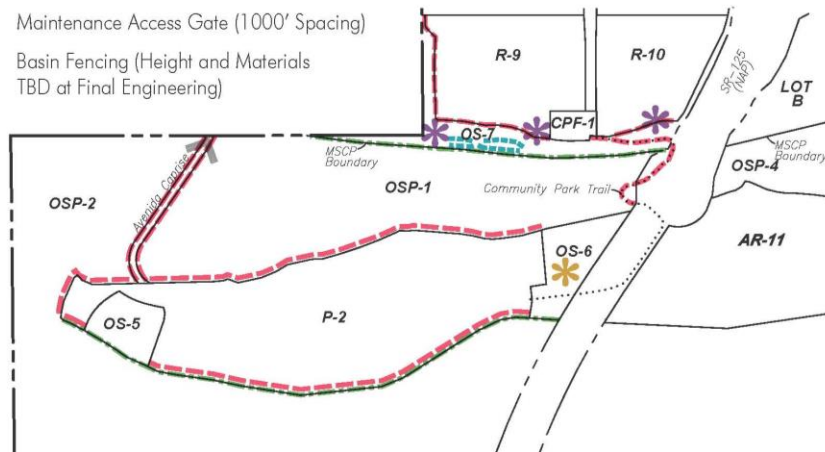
Perimeter Wall (Barrier) at Preserve Edge Plan
